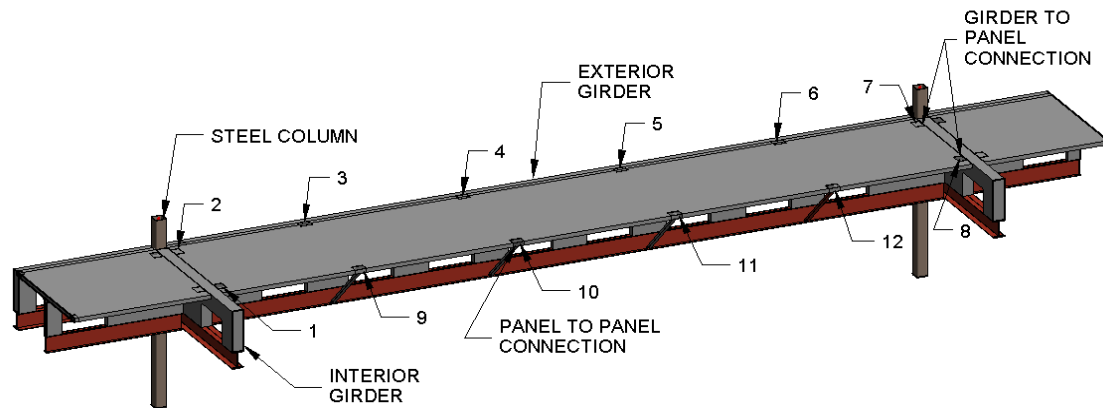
Isometric View of a Panel Surrounded on Three Sides by Girders
